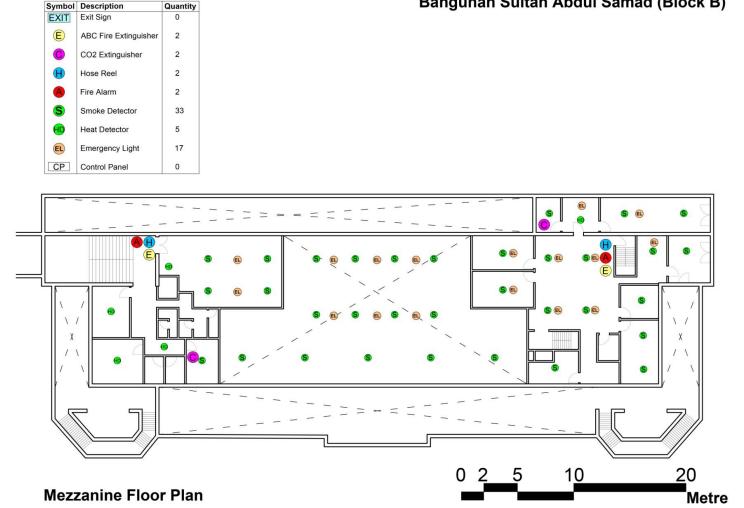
Location of active fire protection measures at Mezzanine Floor Level of Sultan Abdul Samad (Block B)
